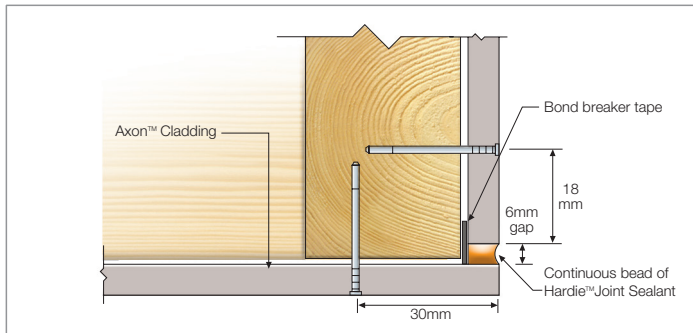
EXTERNAL CORNER - SEALANT FILL
